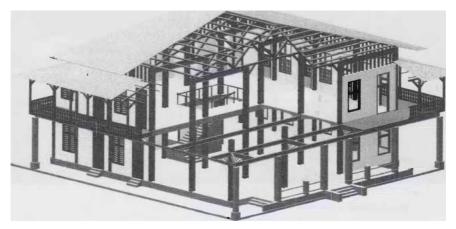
Assembled building House No. 2, courthouse in Dar es Salaam, Source: Author's records.
